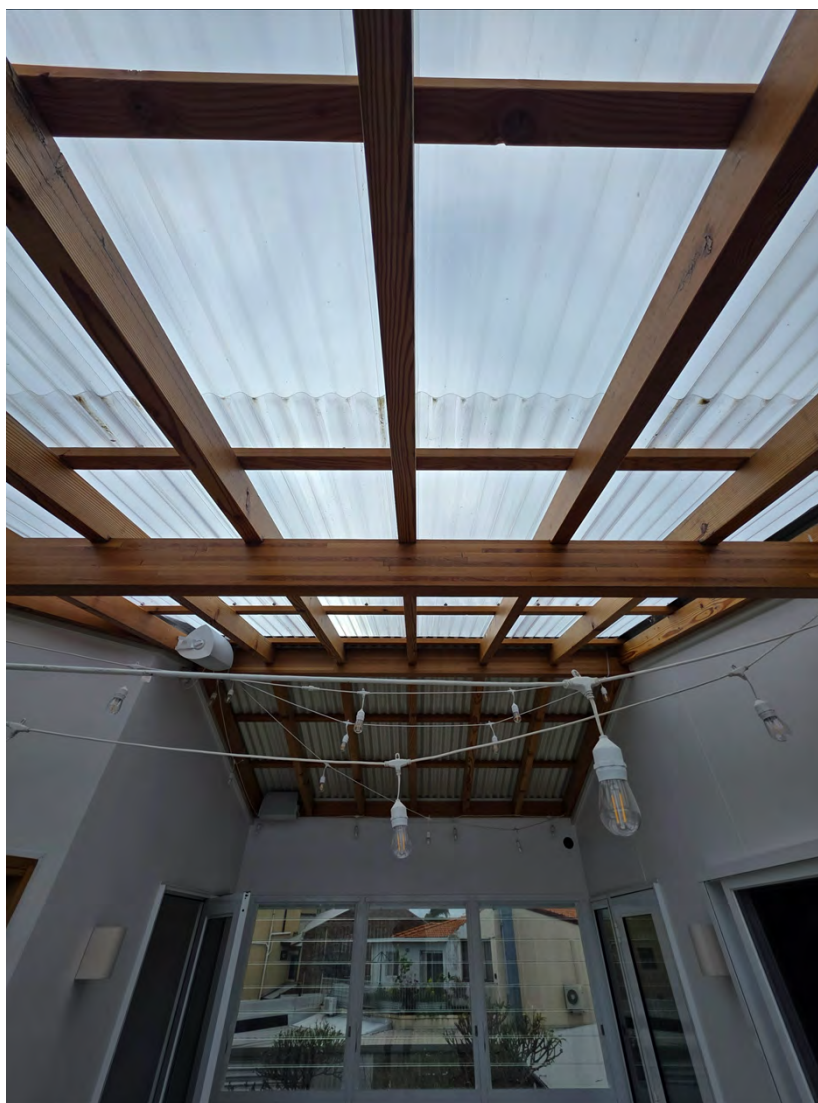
Unauthorised roof sheeting additions (solid Colorbond sheeting to the northern face of roof and 'Laserlite 2000 (clear)' polycarbonate panel sheeting on the southern roof slope) to the first-floor terrace pergola. Image taken 1 July 2026.
